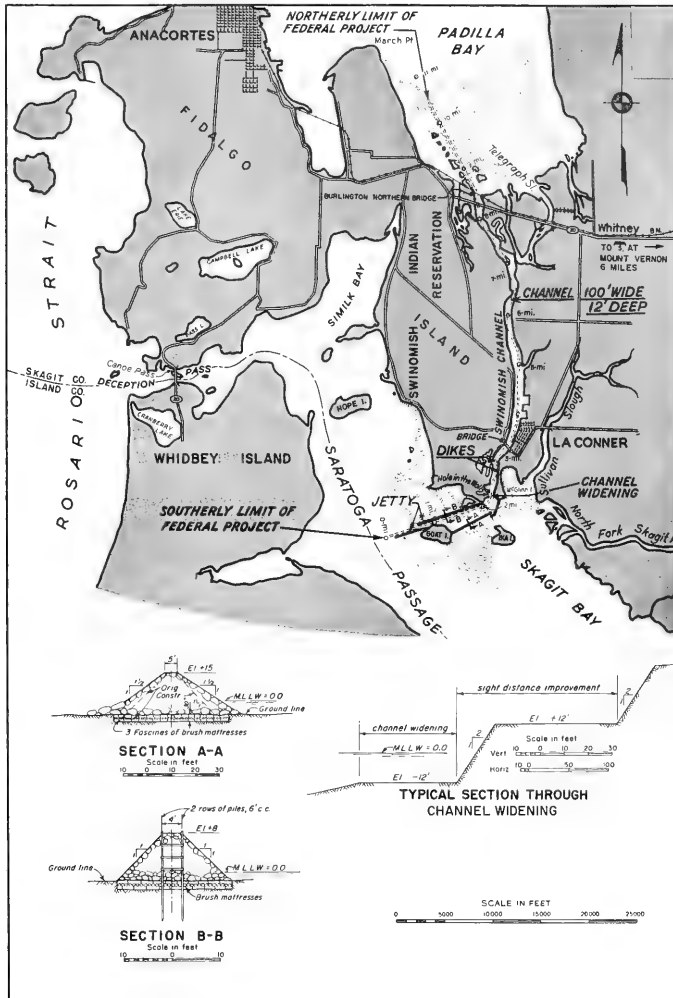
Site layout of Swinomish Channel, Washington (revised 1979)
